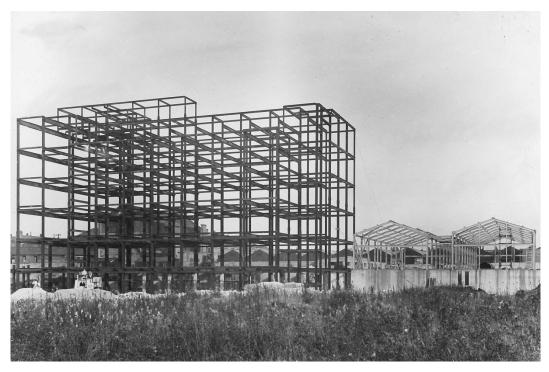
Openshaw Technical College, first instalment: steel frame erection (workshops on the right)
